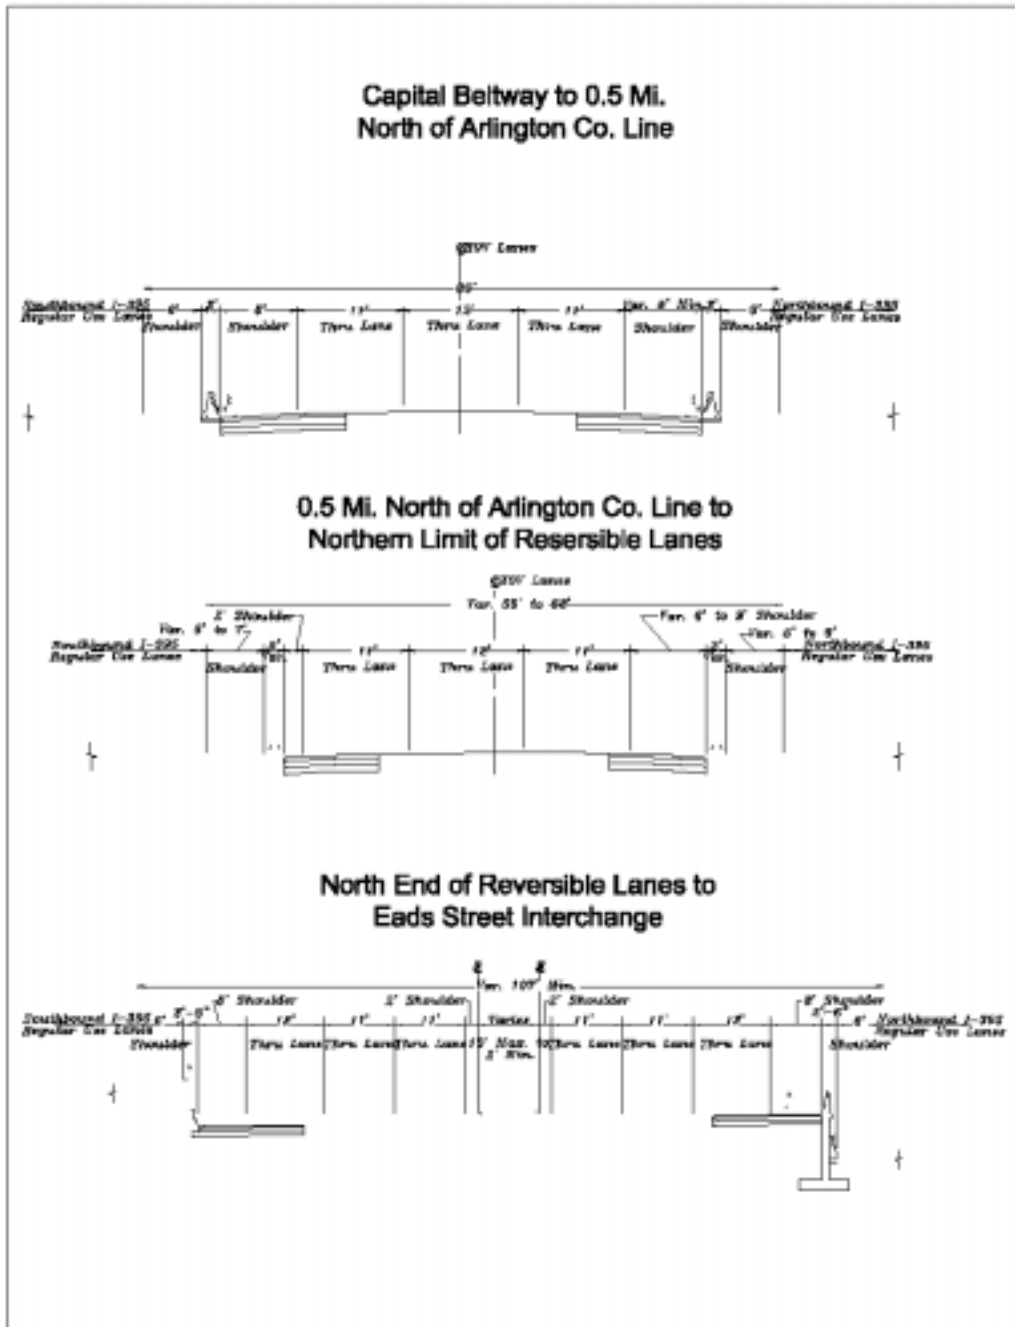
Typical Existing Cross Sections of I-395 HOV Lanes
